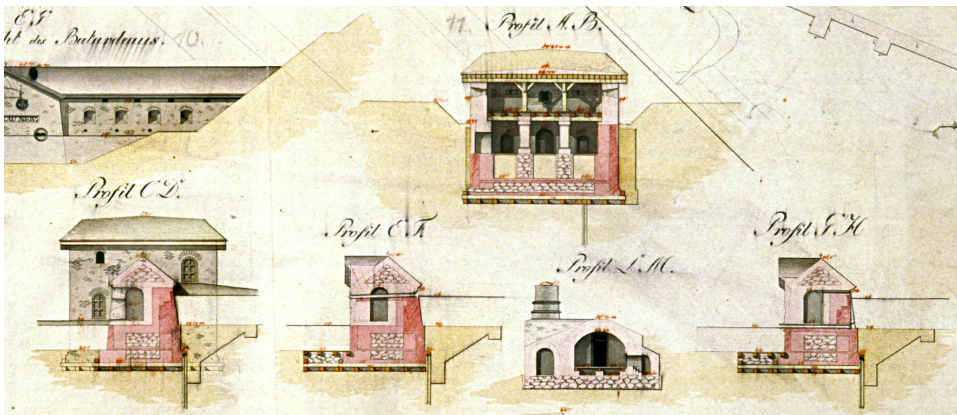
A fragment of the drawing of Cofferdam IV in Toruń, 1824 (GStA PK E 70716, after: ATT, Z. 6, Fig. 39), cross sections. Visible use of clay as a barrier protecting the wall of the blockhouse against infiltration of water from the ground (profile AB) and a barrier protecting the Cofferdam against washing out by high water in the moat (profiles CD, EF, GK). The sections are marked as "peaceful" and "wartime". (high) water level in the moat
